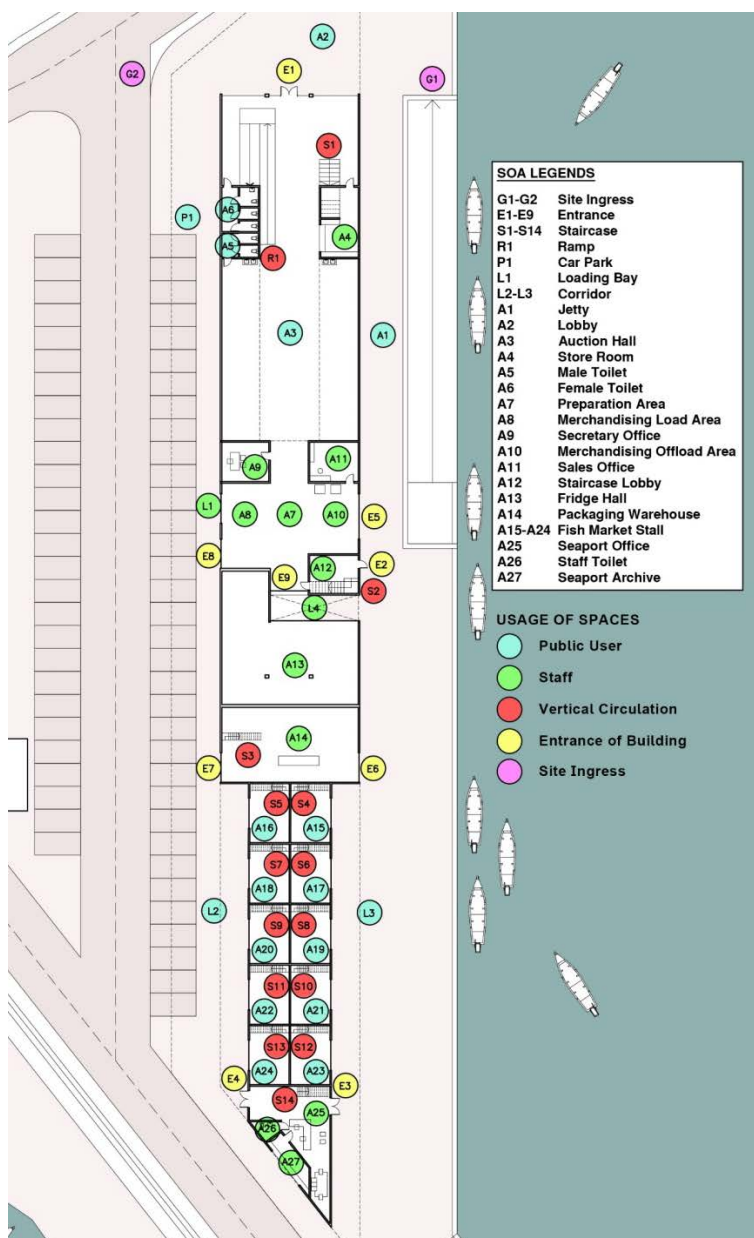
Site Plan and Ground floor plan of Fisterra Fish Market, Spain & SOA.
